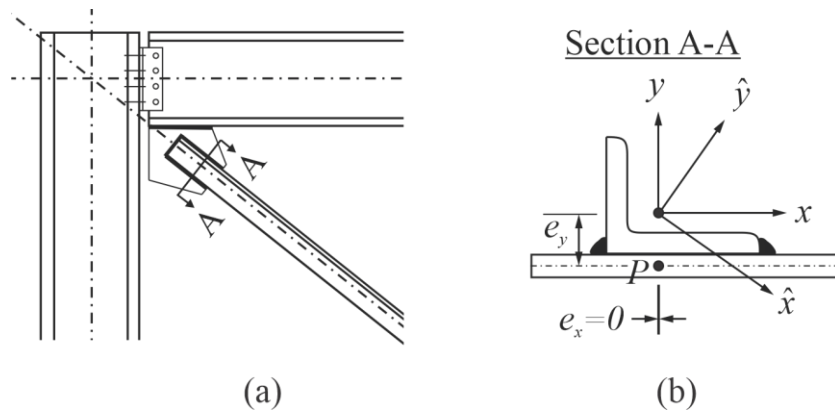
angle-gusset plate connection in bracing systems, (b) cross-sectional view A-A at the connection
